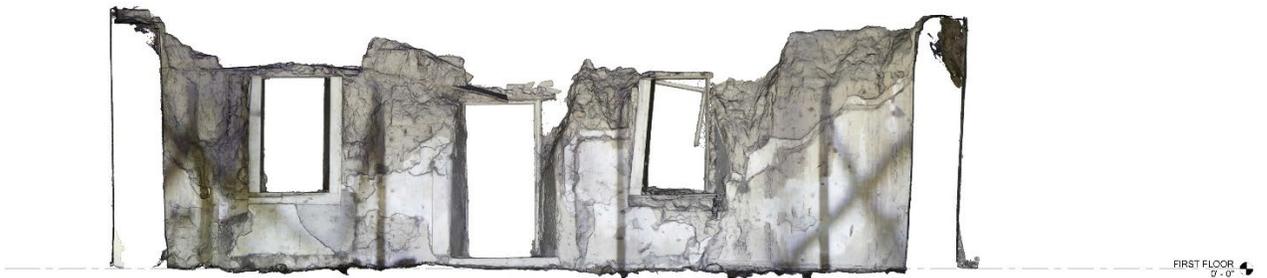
Trujillo Adobe scans of west and south exterior elevations
